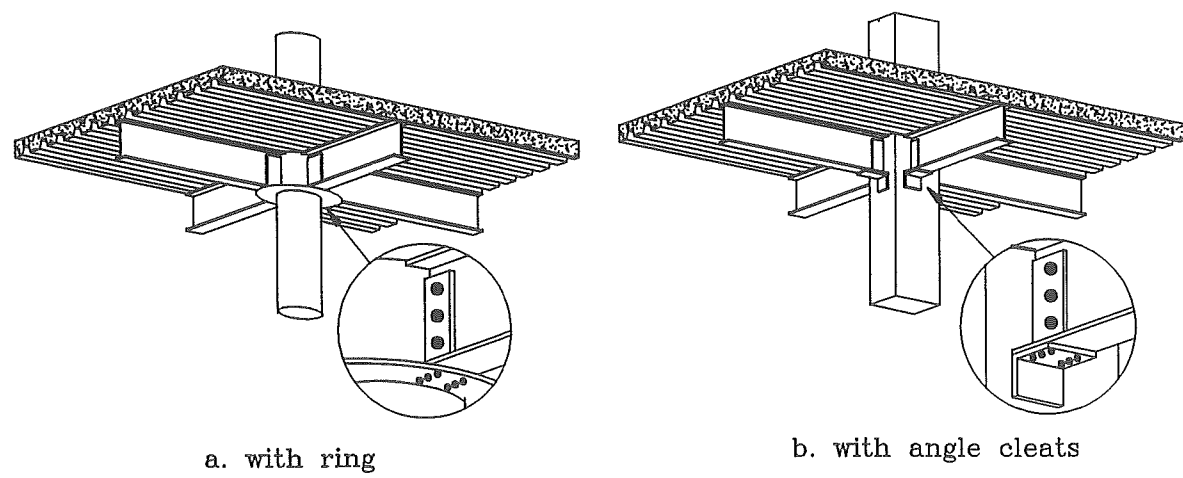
Semi-rigid bolted beam-to-column connections
